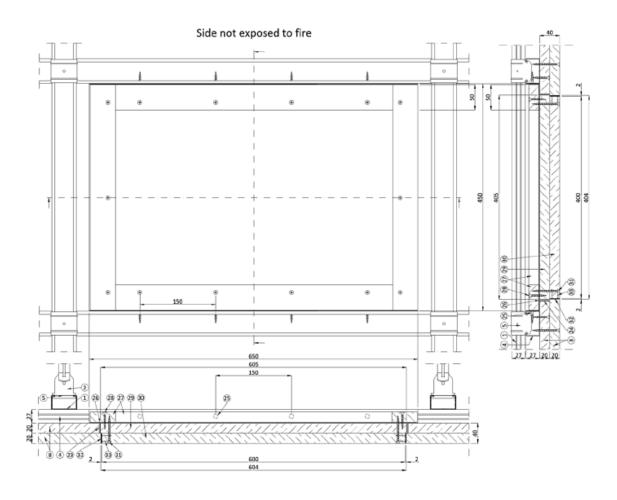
Schematic drawing of fitting "D"
